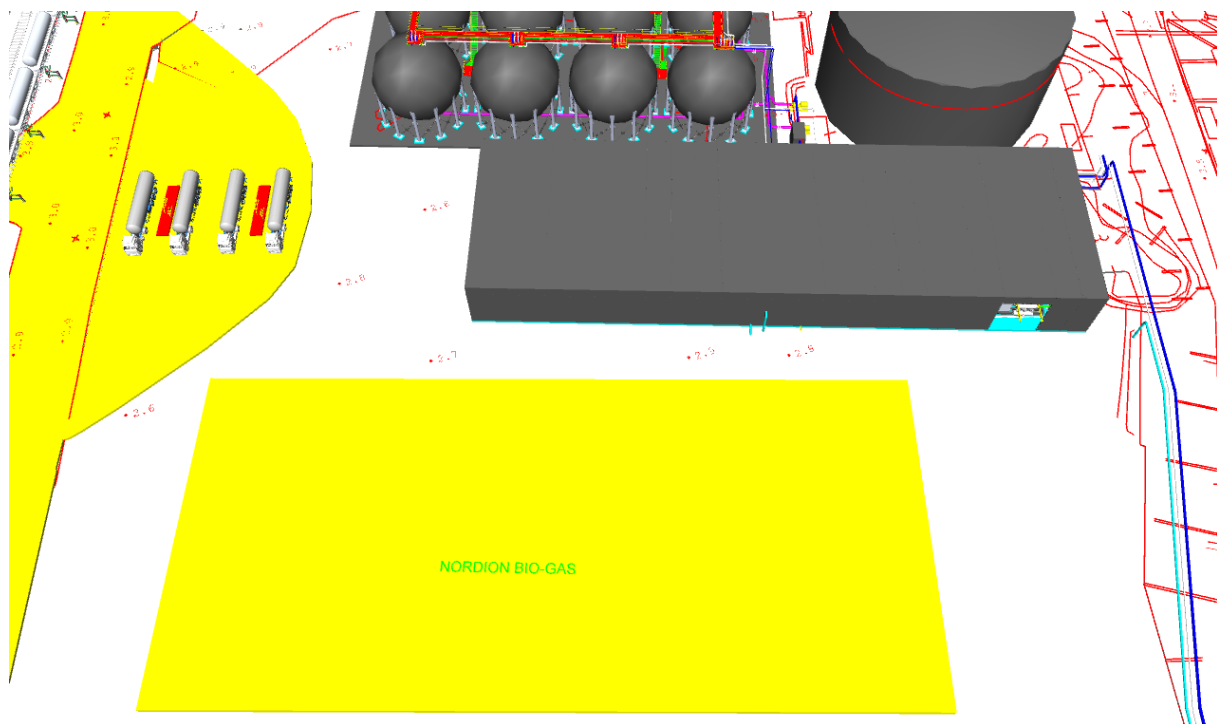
Layout terminal area incl. the planned Nordion bio-gas plant
